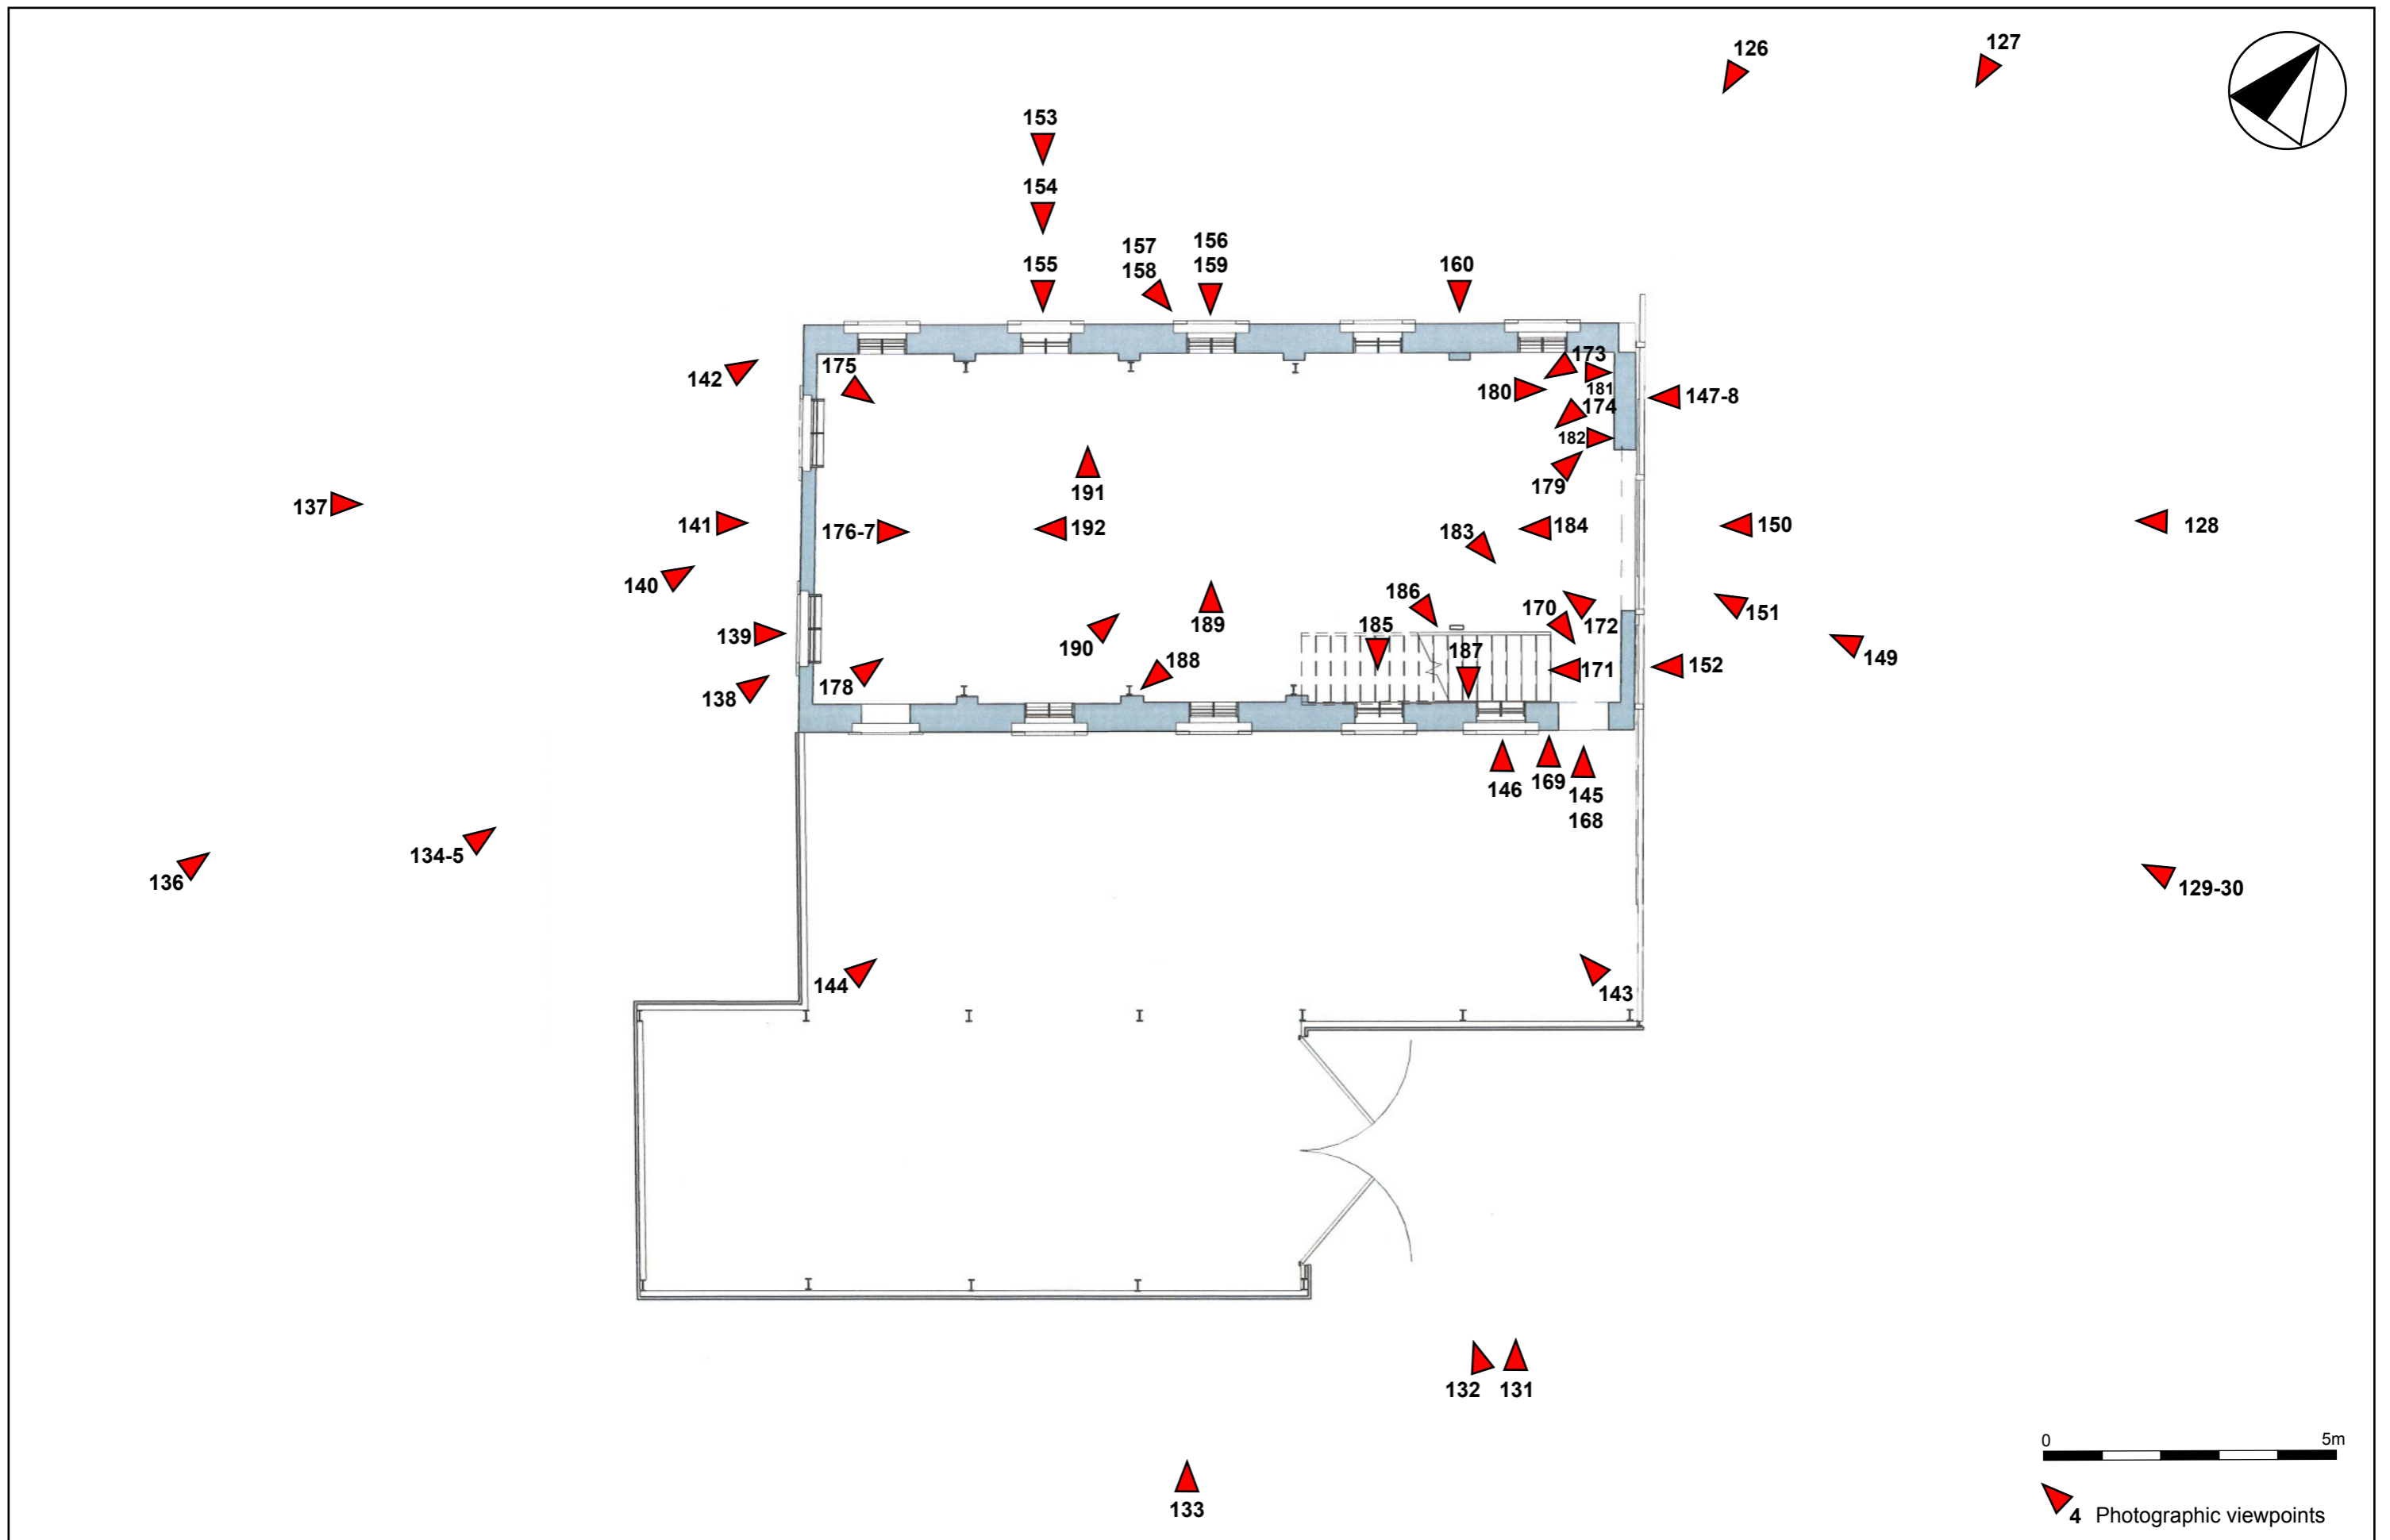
Sketch plan of the lace factory with the photographic viewpoints indicated.
